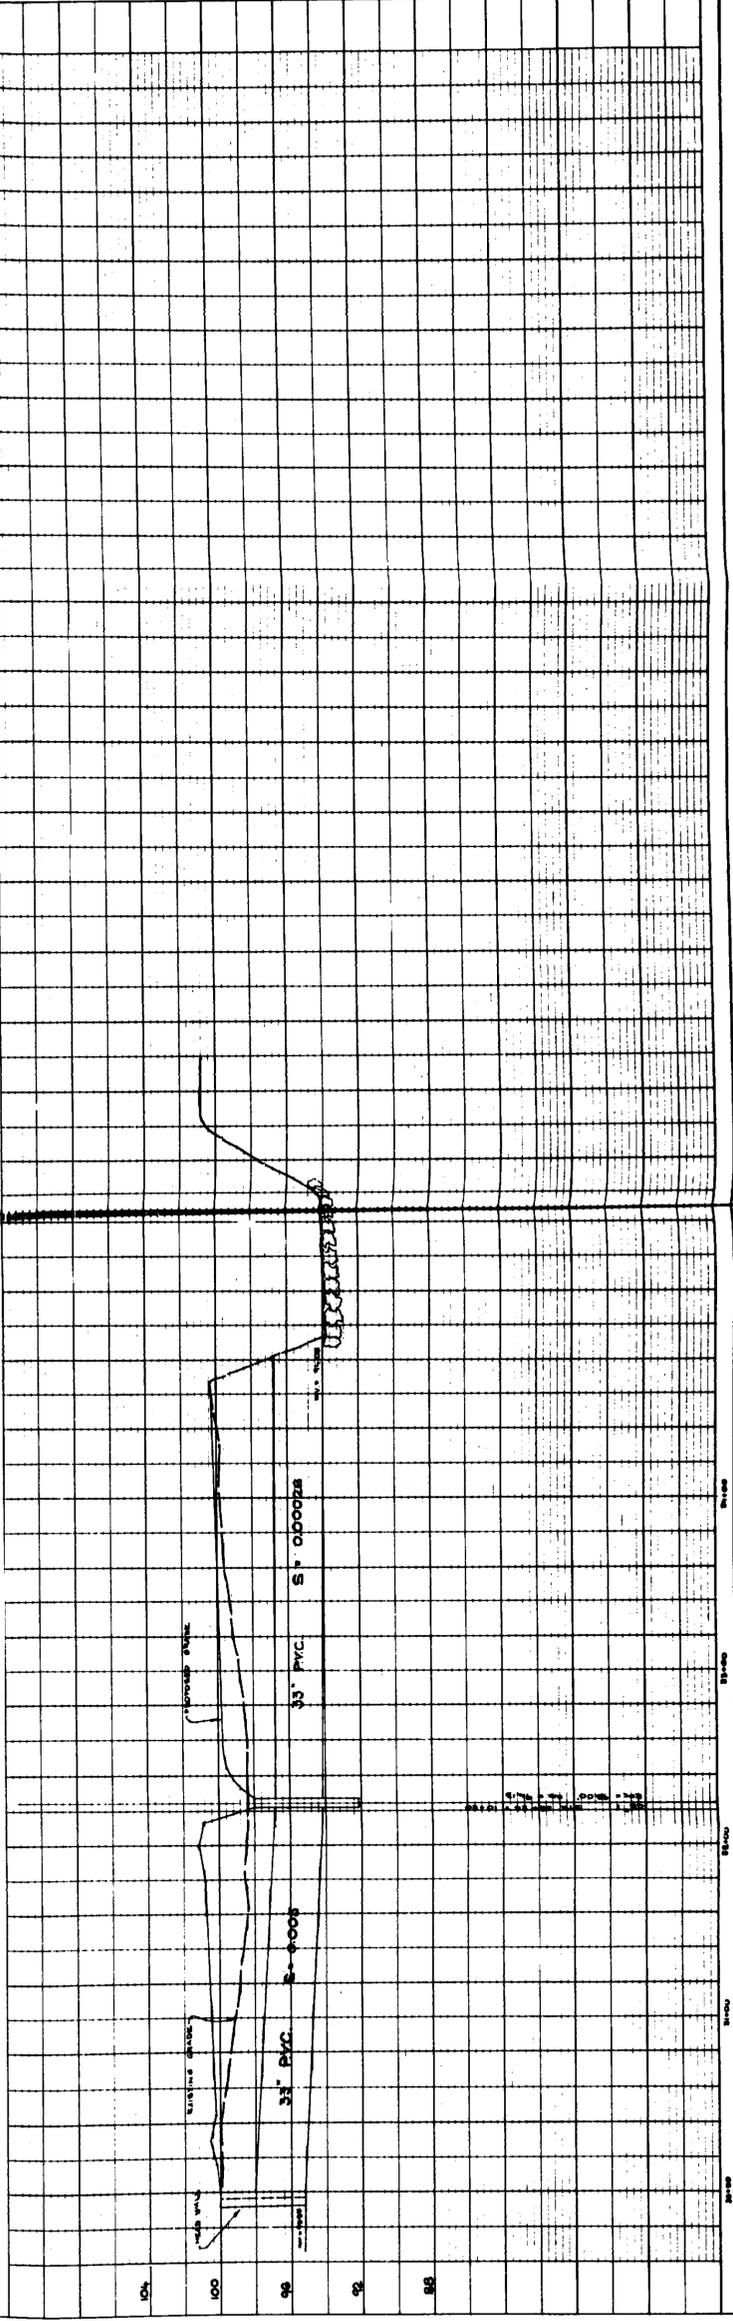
SINGLE PIPES AND PROFILES - FULL LINE
